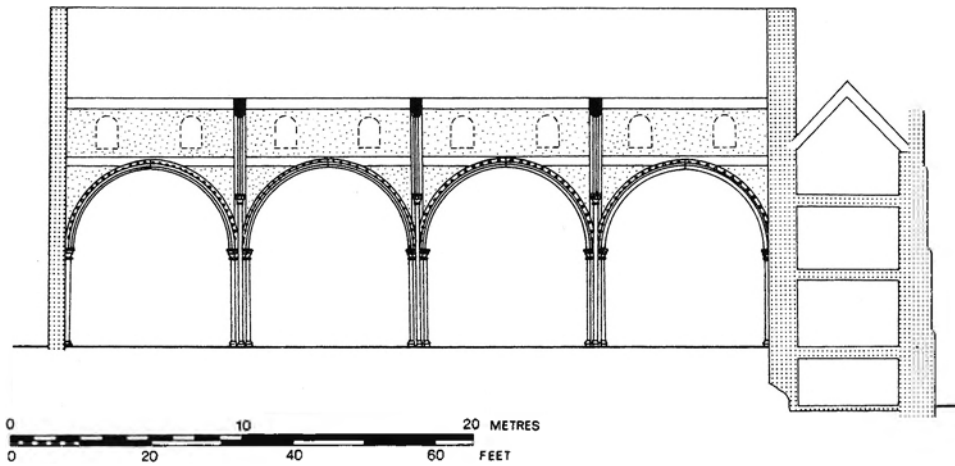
Hereford Bishop's Palace: long section reconstructed as original.
